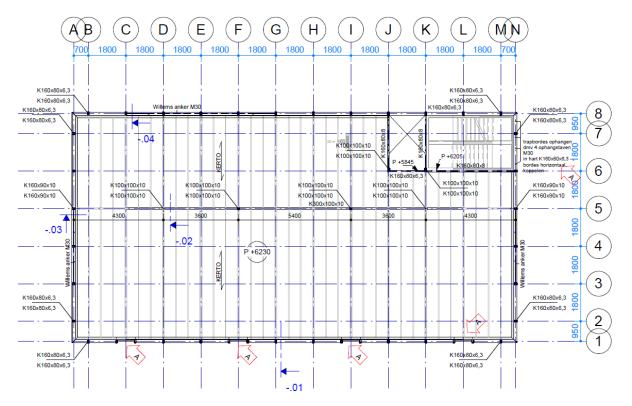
Plan first floor Bouwdeel D (IMd Raadgevende Ingenieurs)
